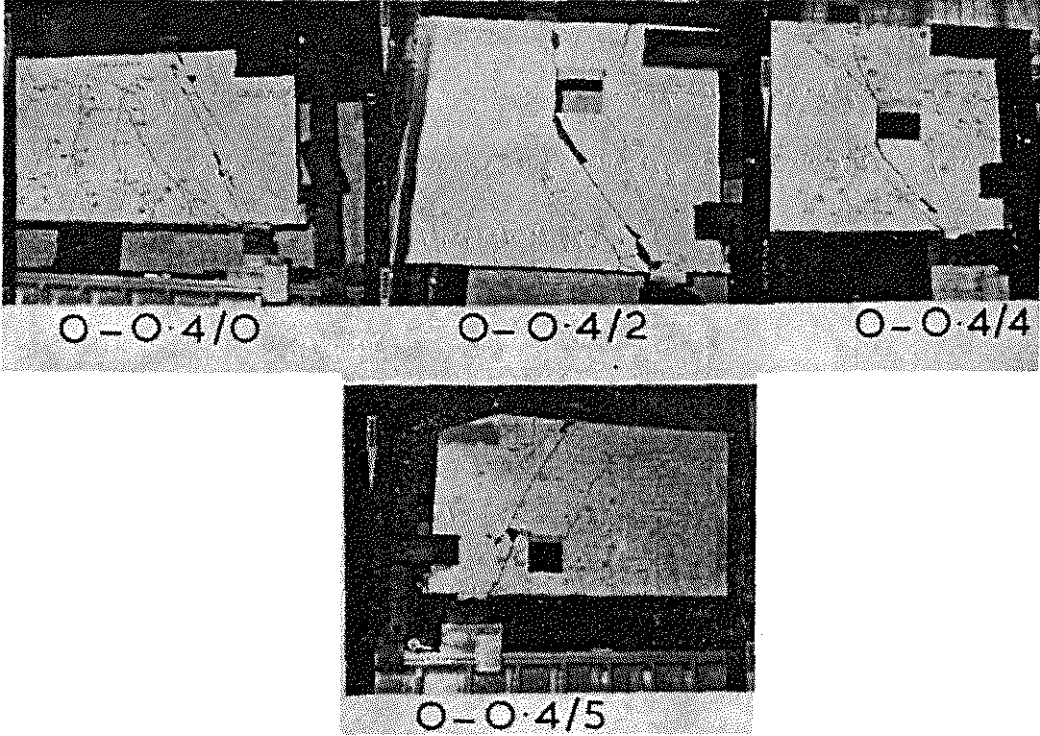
Vertical edge cracking patterns for beam without web reinforcement.
